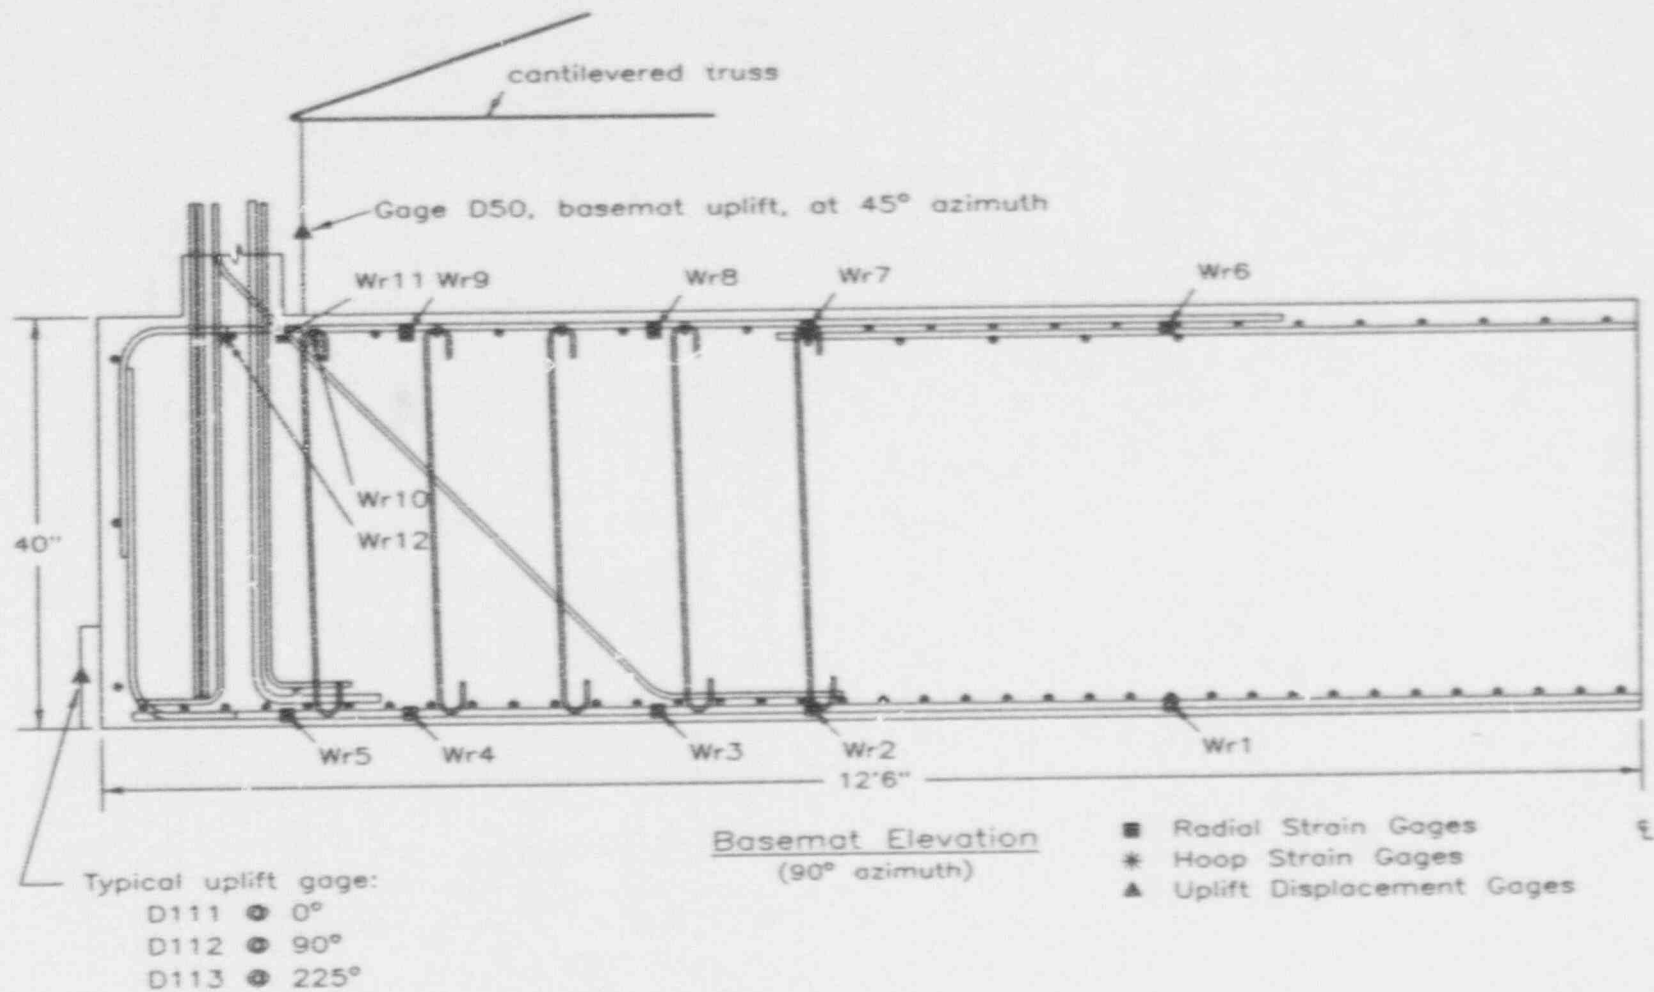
Basemat Elevation at Azimuth 90 Degrees
